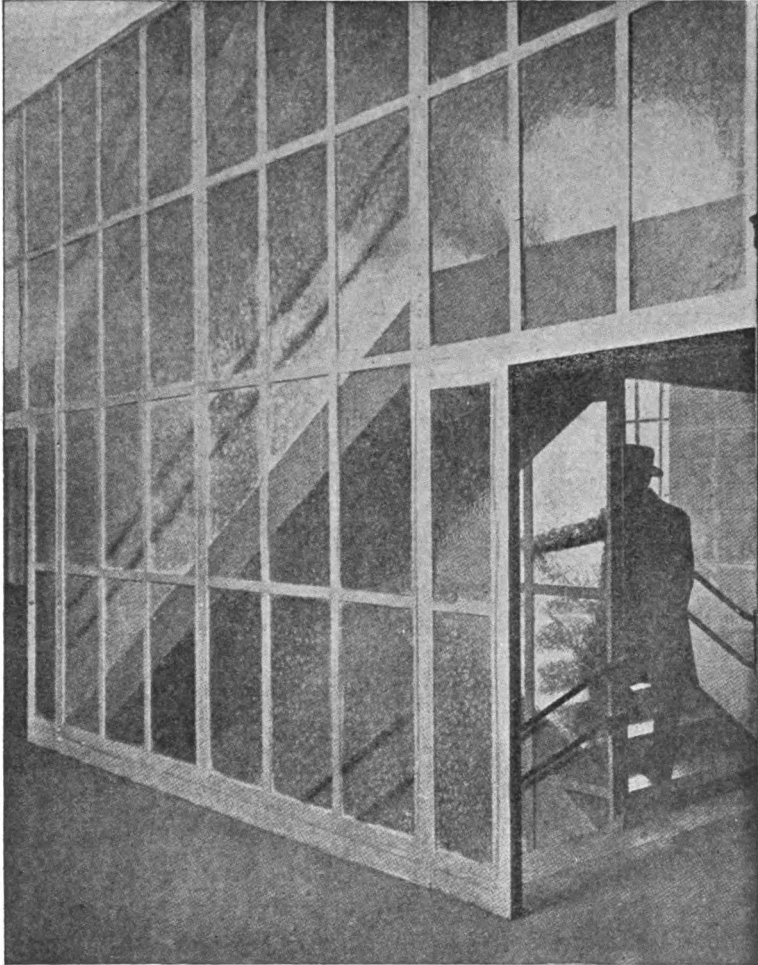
If Brick or Tile or Concrete Enclosing Walls to Stairs and Elevators are Undesirable, then Install Frames and Wire Glass
